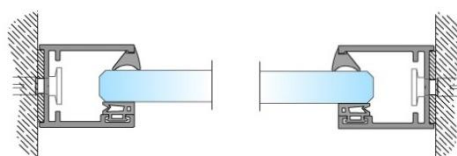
## DETAIL OF PARTITIONS AT THE FLOOR, CEILING AND WALL WITH P47 PROFILES
